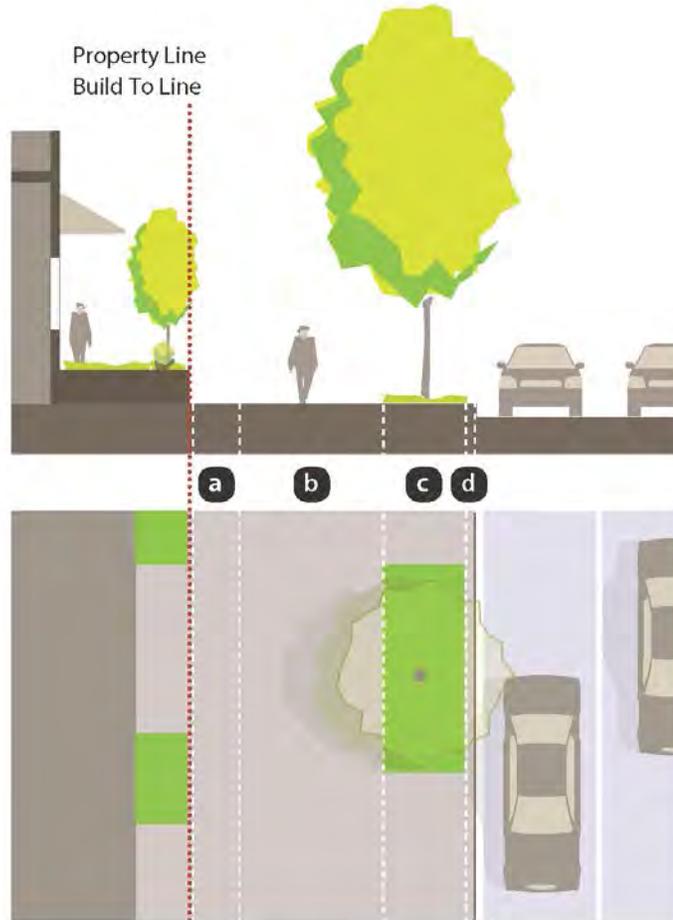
, Golf Club Road Sidewalk Improvements
